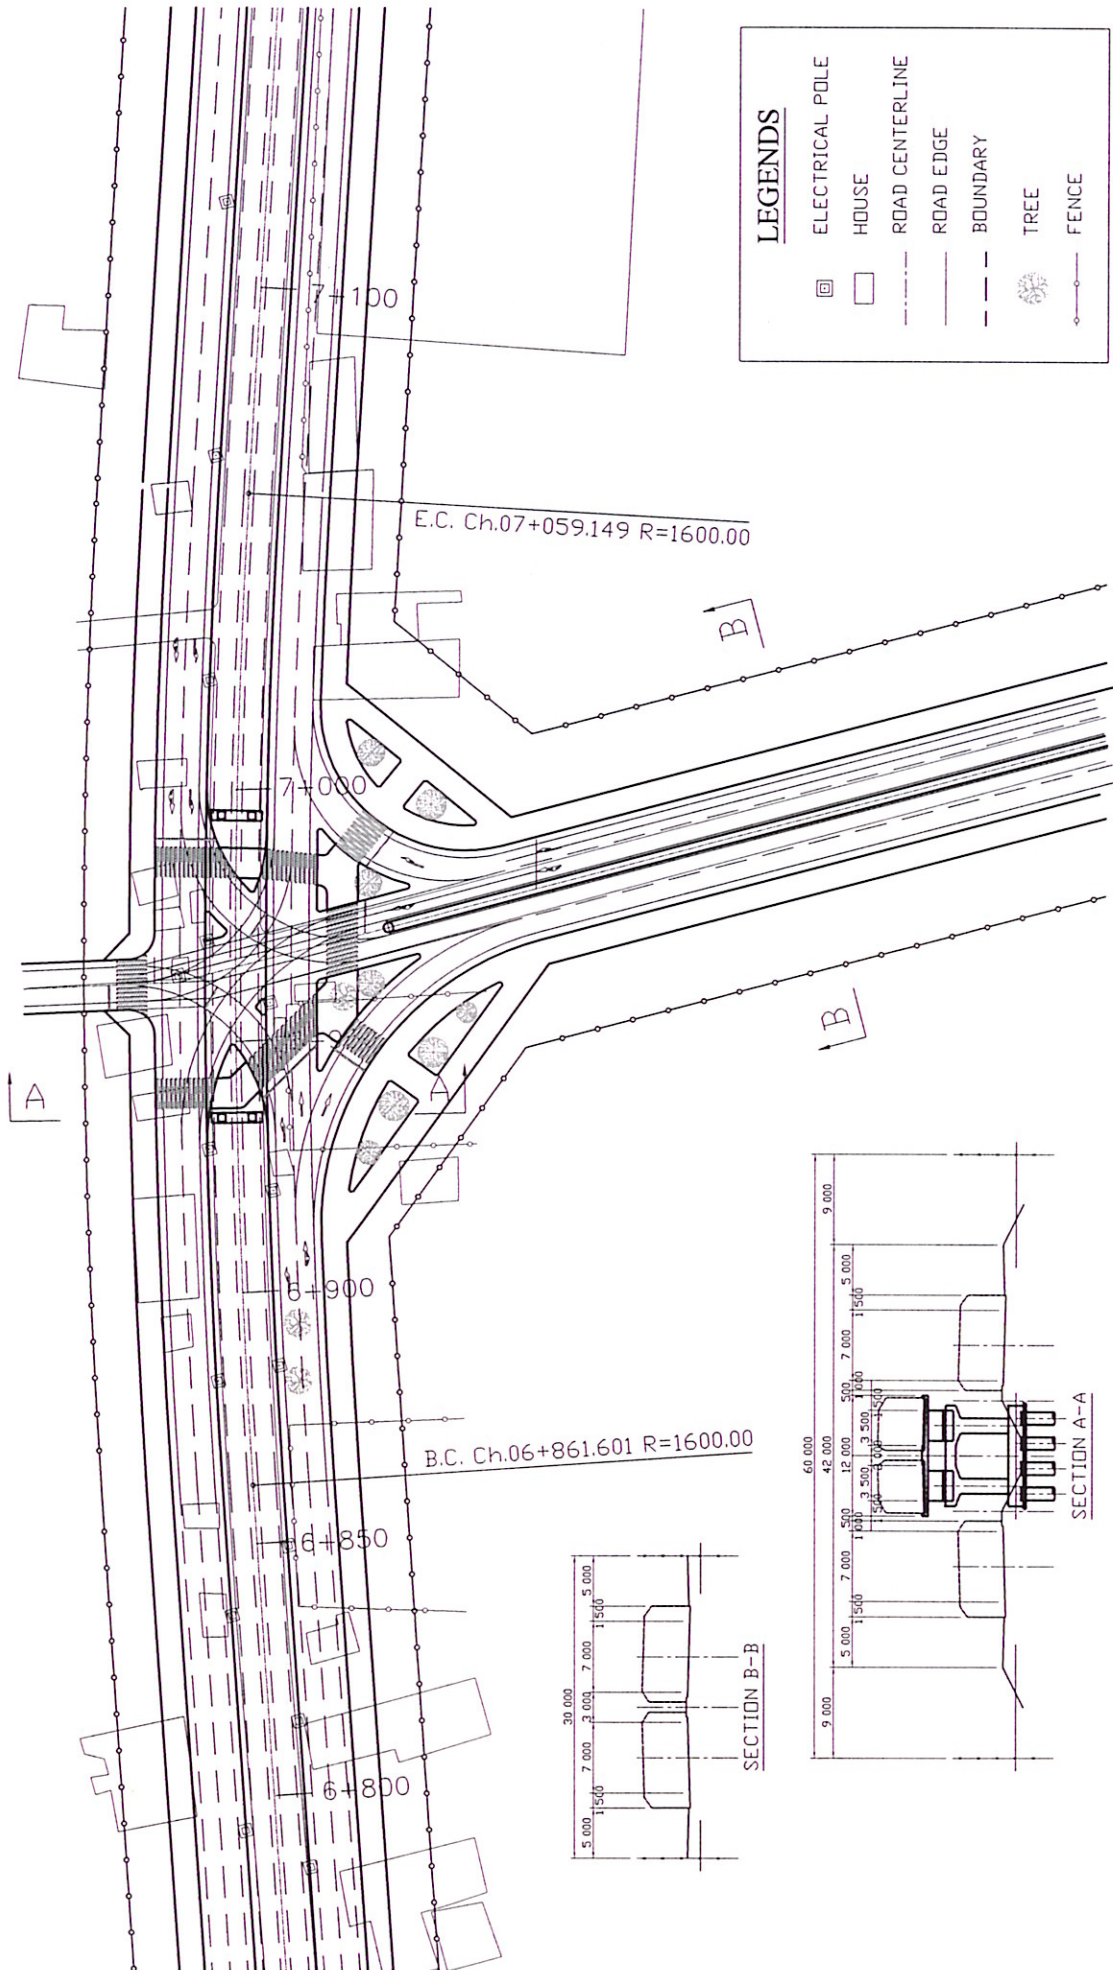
Conceptual Plan for Intersection with Tiger Beer Road with a Space for Future Development
